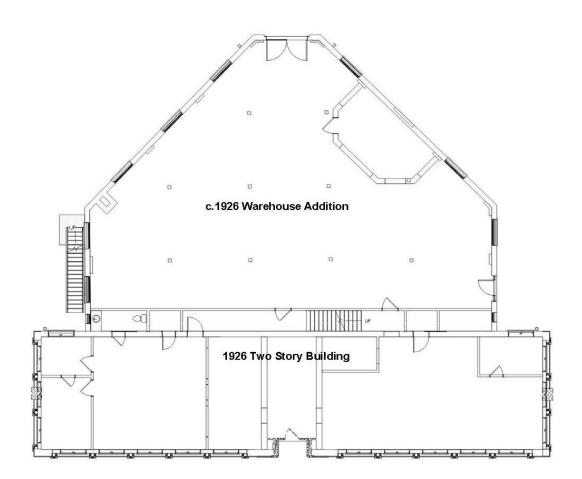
First floor site plan (Thomas A. Hammer, 2022).
